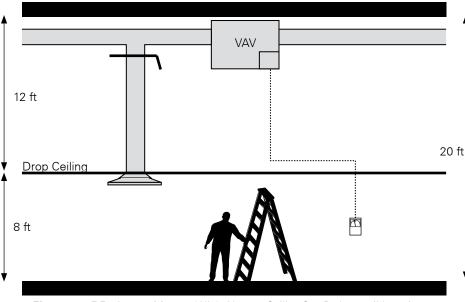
F Equipment Mounted High Above a Ceiling Can Be Impossible to Access
